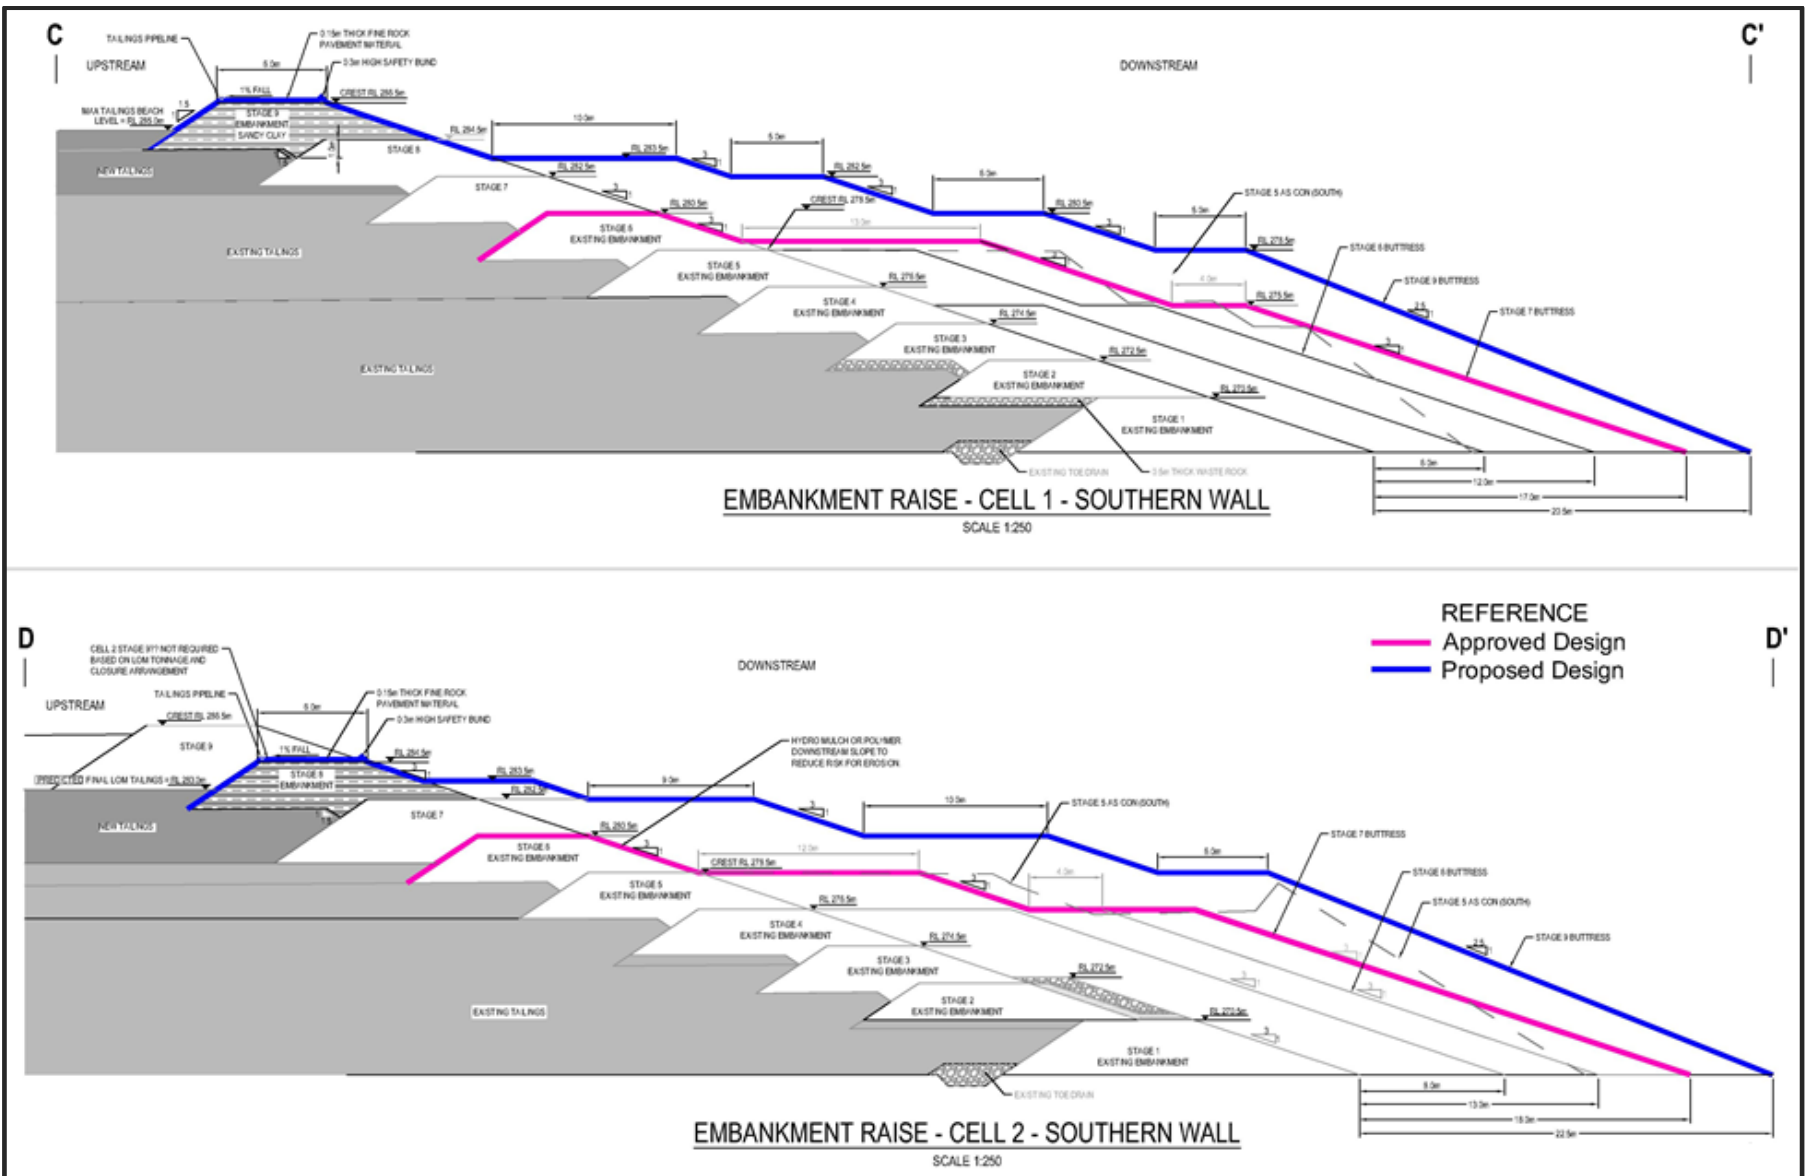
| Proposed RSF Embankment Raise, Southern Cross-Sections – Concept Design (Source: Tomingley Gold Operations Pty Ltd)
